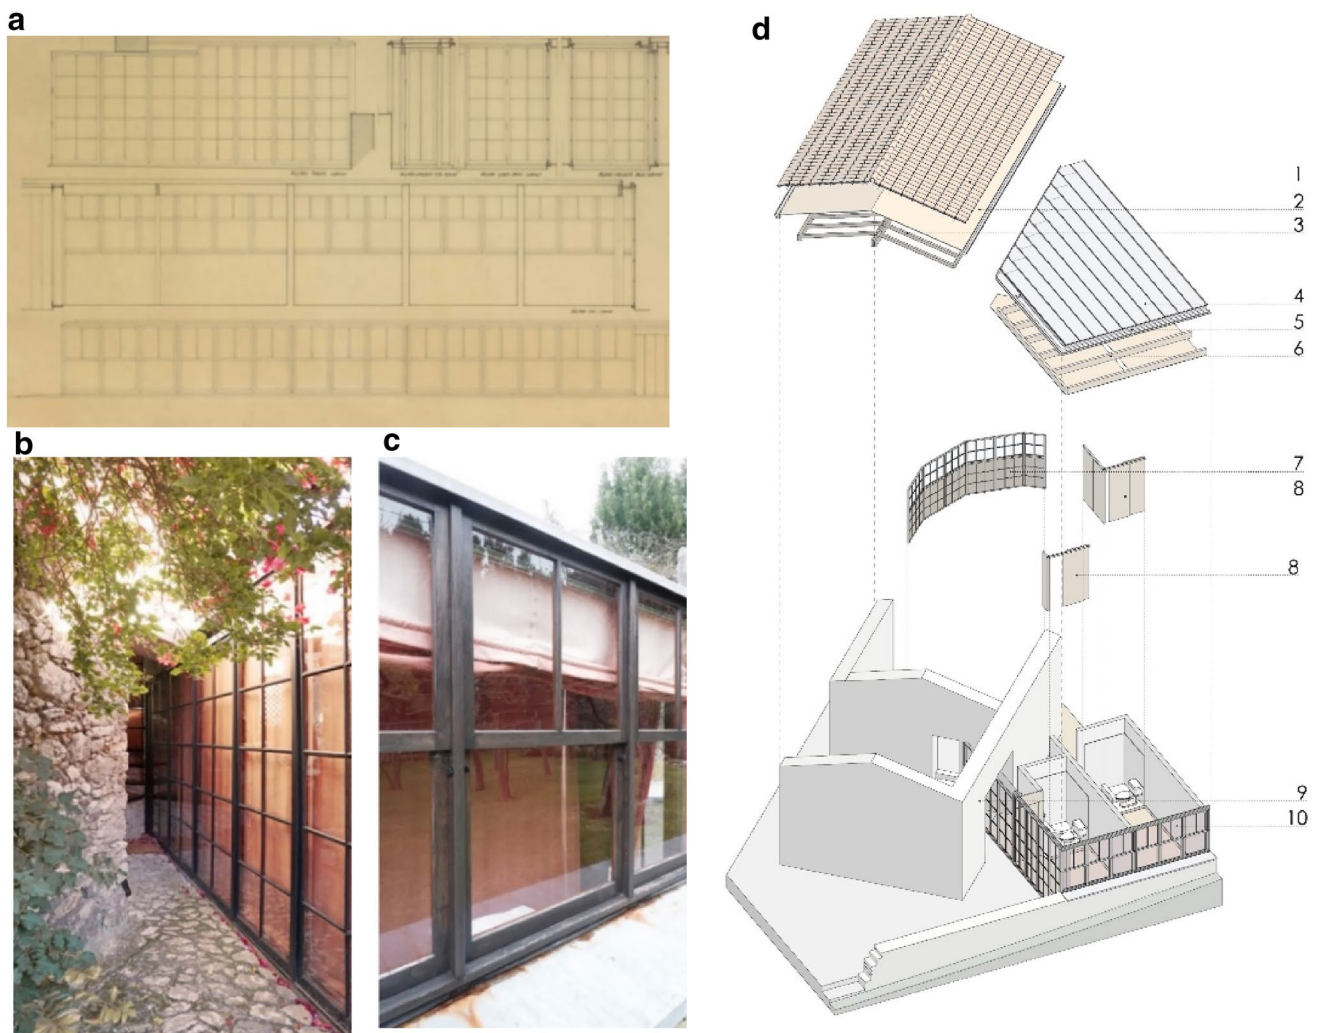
Tectonics, materiality, detail (phase 1): a Constructive details of the glass curtain wall; b Stone wall and wooden curtain wall; c Wooden curtain wall; d Legend: 1 Roman tile, 2 Wooden ceiling with
